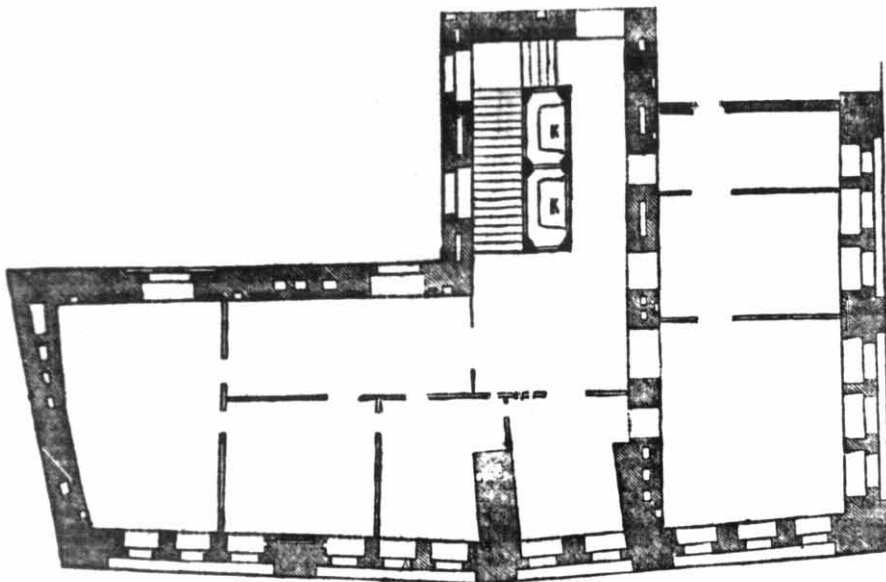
New York Tribune* Building, plan of first floor, Phase one, 1875
